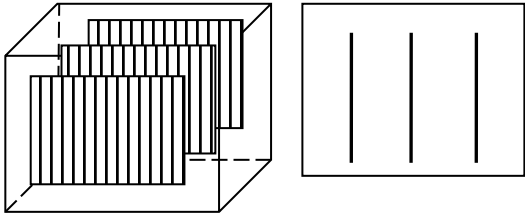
Orientation of steel fibre in the concrete mix in 90°.
